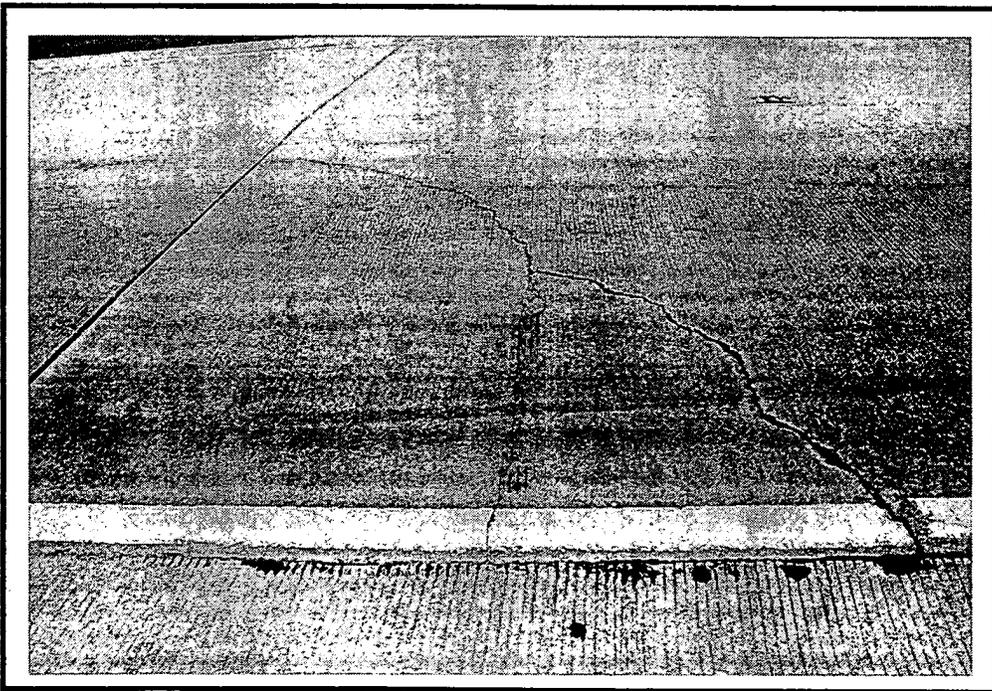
Corner Breaks in Jointed Concrete Pavement, High Severity
